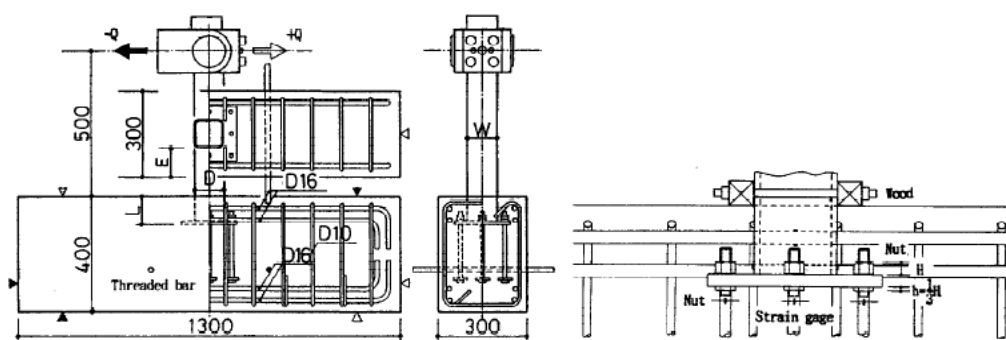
Specimen setup and installation of the steel column base in (Nakashima, 1996).
